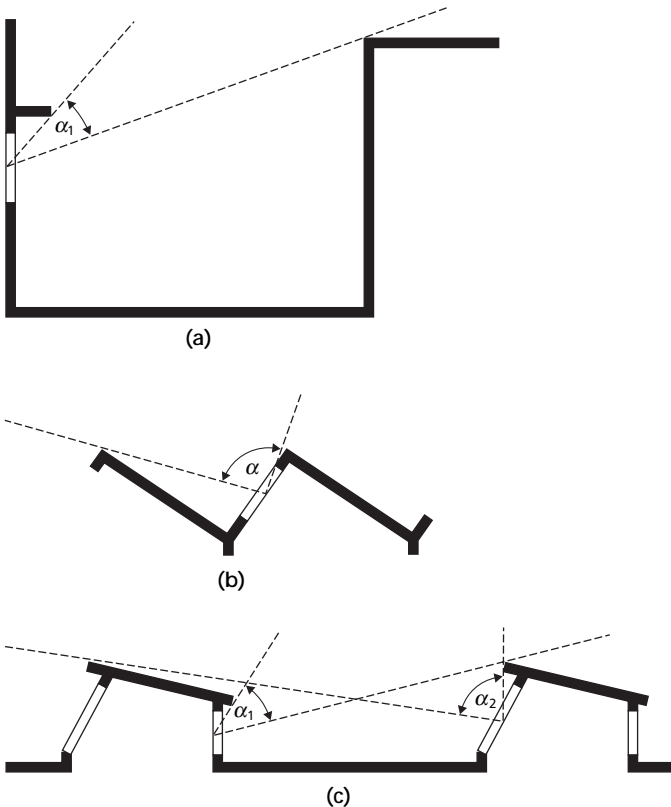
Angle of sky (α) seen from centre of window; (a) window obstructed by overhang and nearby wall, (b) rooflight obstructed by roof construction, (c) different windows facing different obstructions
